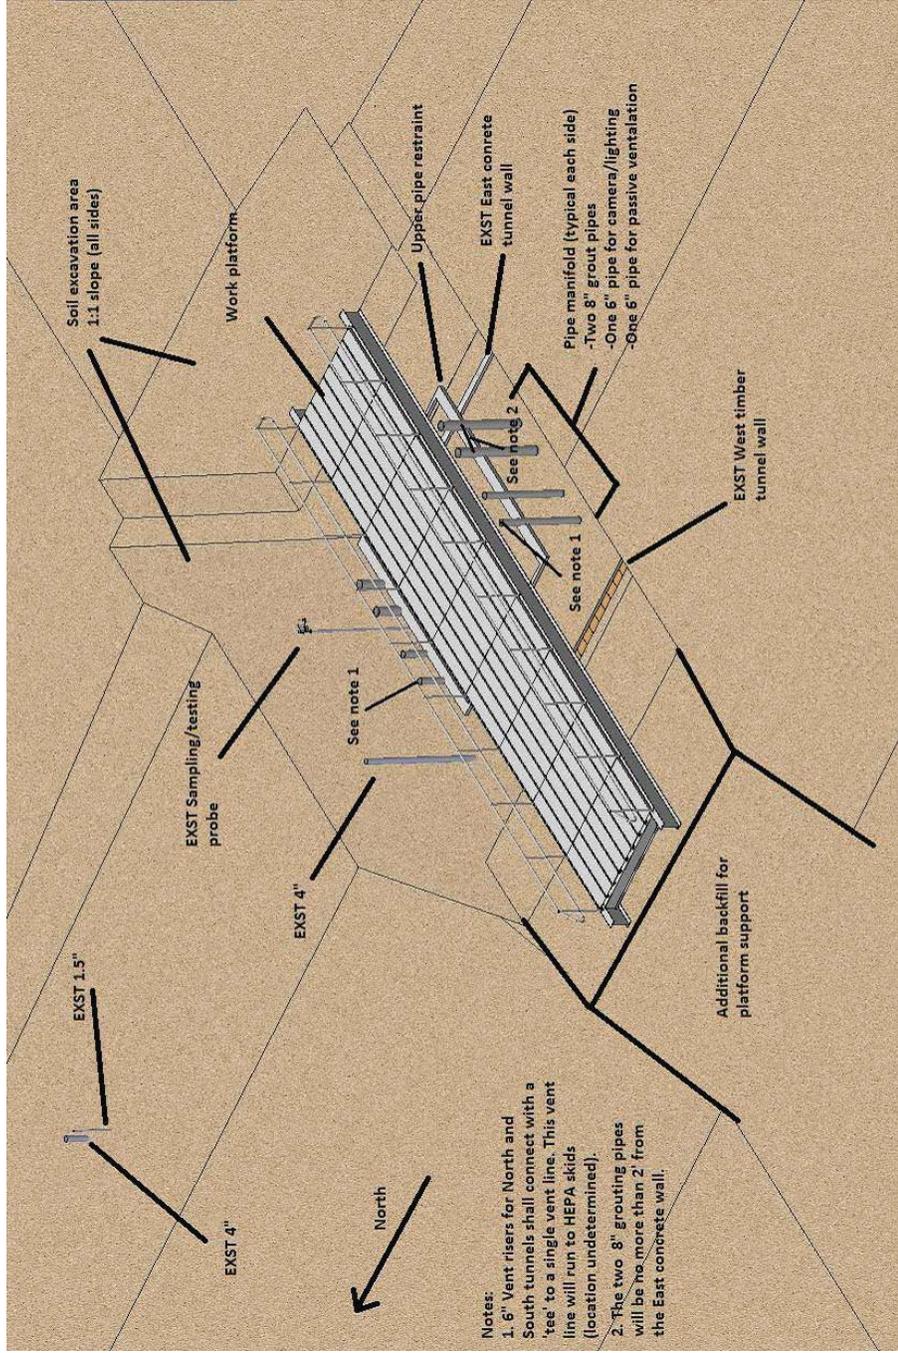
Isometric of Tunnel Number 1 Grouting Equipment – Platform and Piping Arrangement
